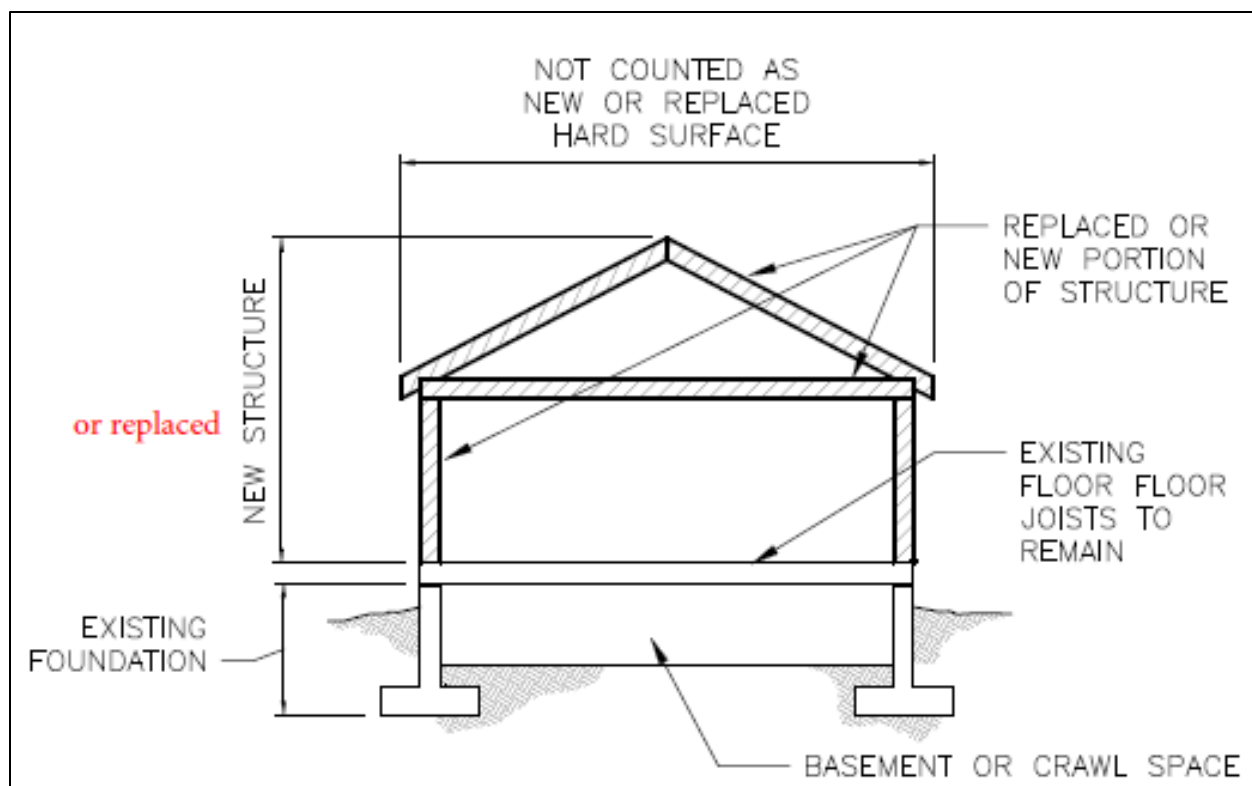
Example of Existing Hard Surface to Remain – Existing Floor Joists to Remain. (New Figure)
